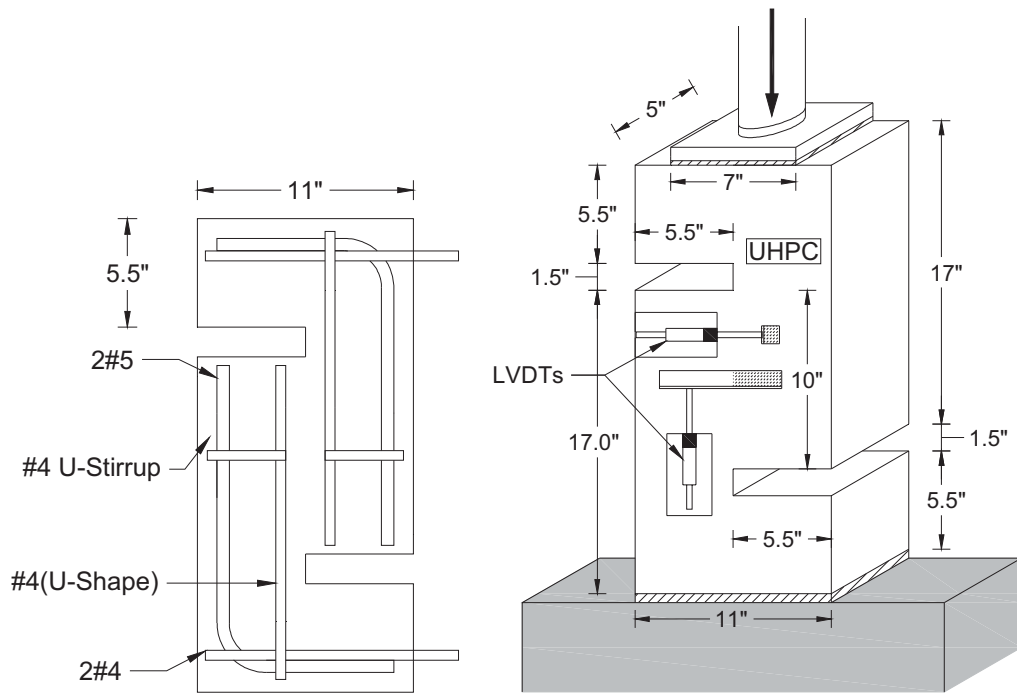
L-Shape Push-off Specimen Details and Test Setup and Instrumentation.
